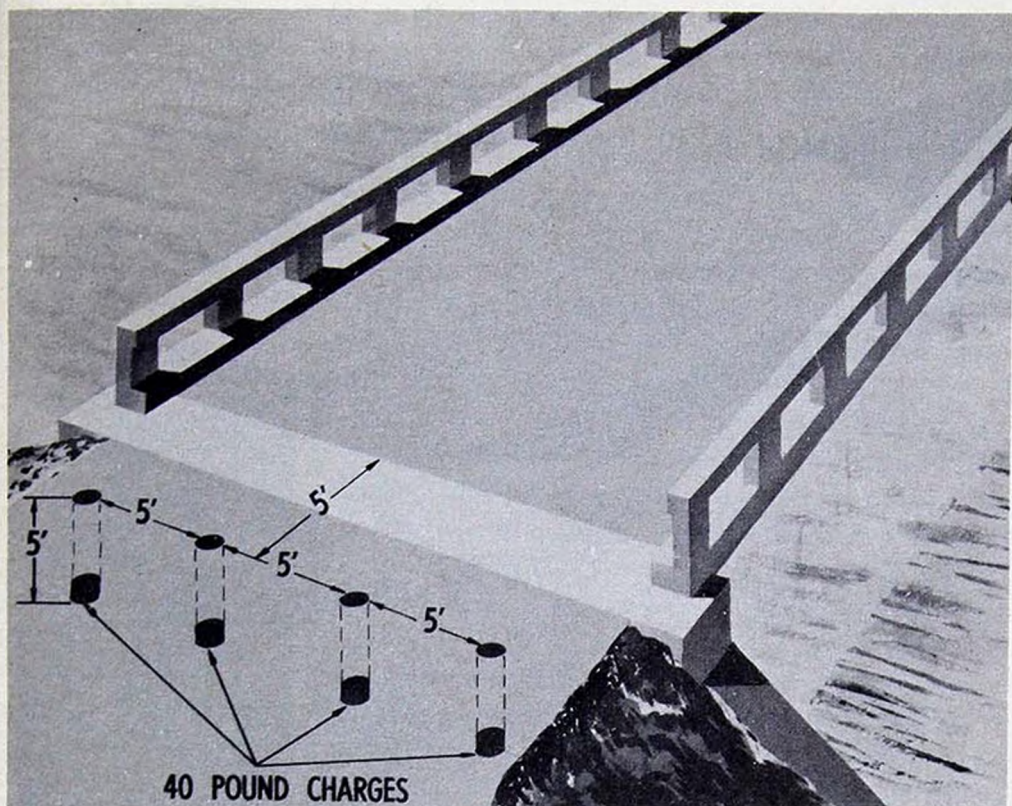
Charges placed in the fill behind a reinforced concrete abutment less than 5 feet thick.
